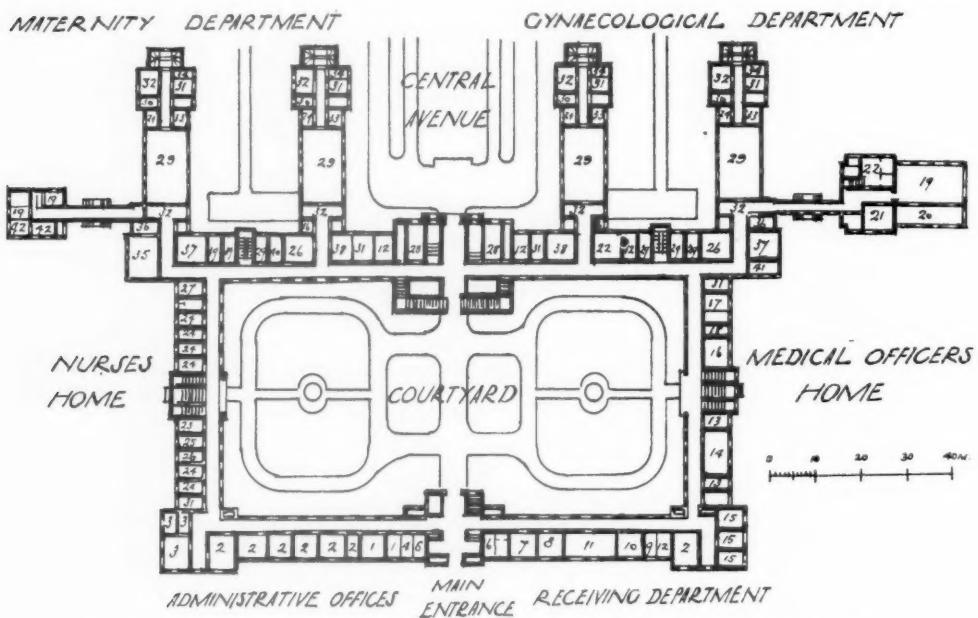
GROUND FLOOR PLAN OF THE ADMINISTRATIVE BLOCK, THE VIRCHOW HOSPITAL, BERLIN.
